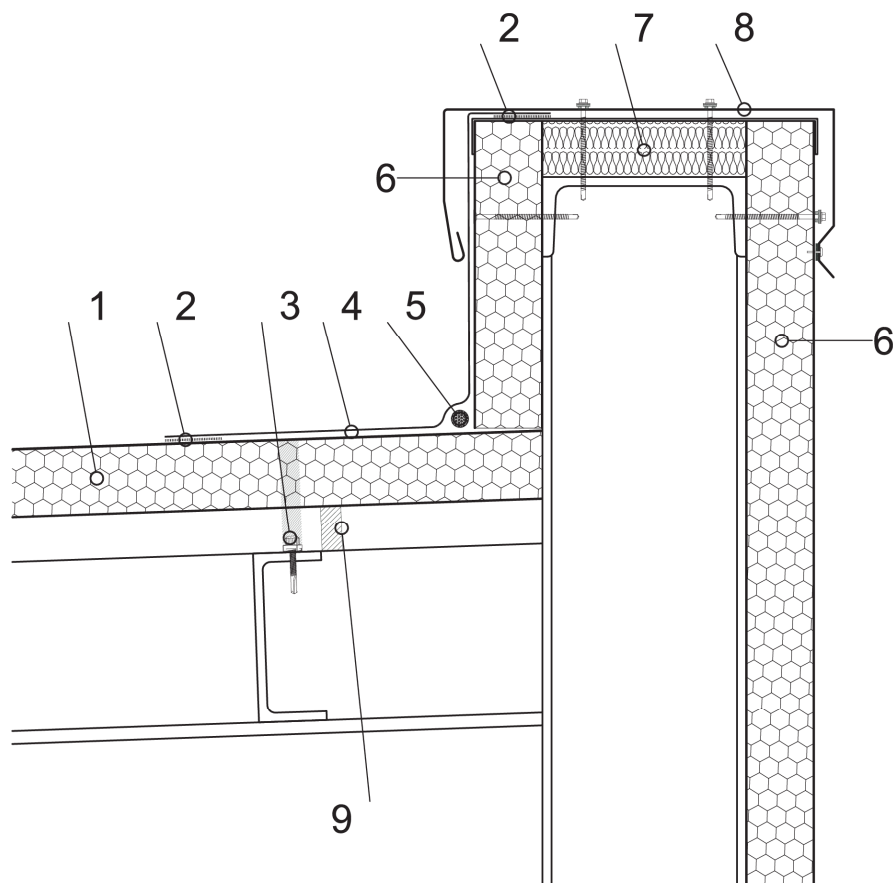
DETAIL OF RIDGE FOR ROOF WITH SINGLE PITCH SLIGHT SLOPE
